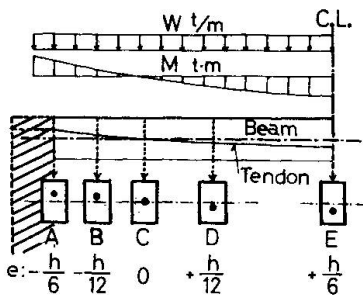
Tendon profile of prestressed concrete beam in a rigid frame. (e: eccentricities.)
